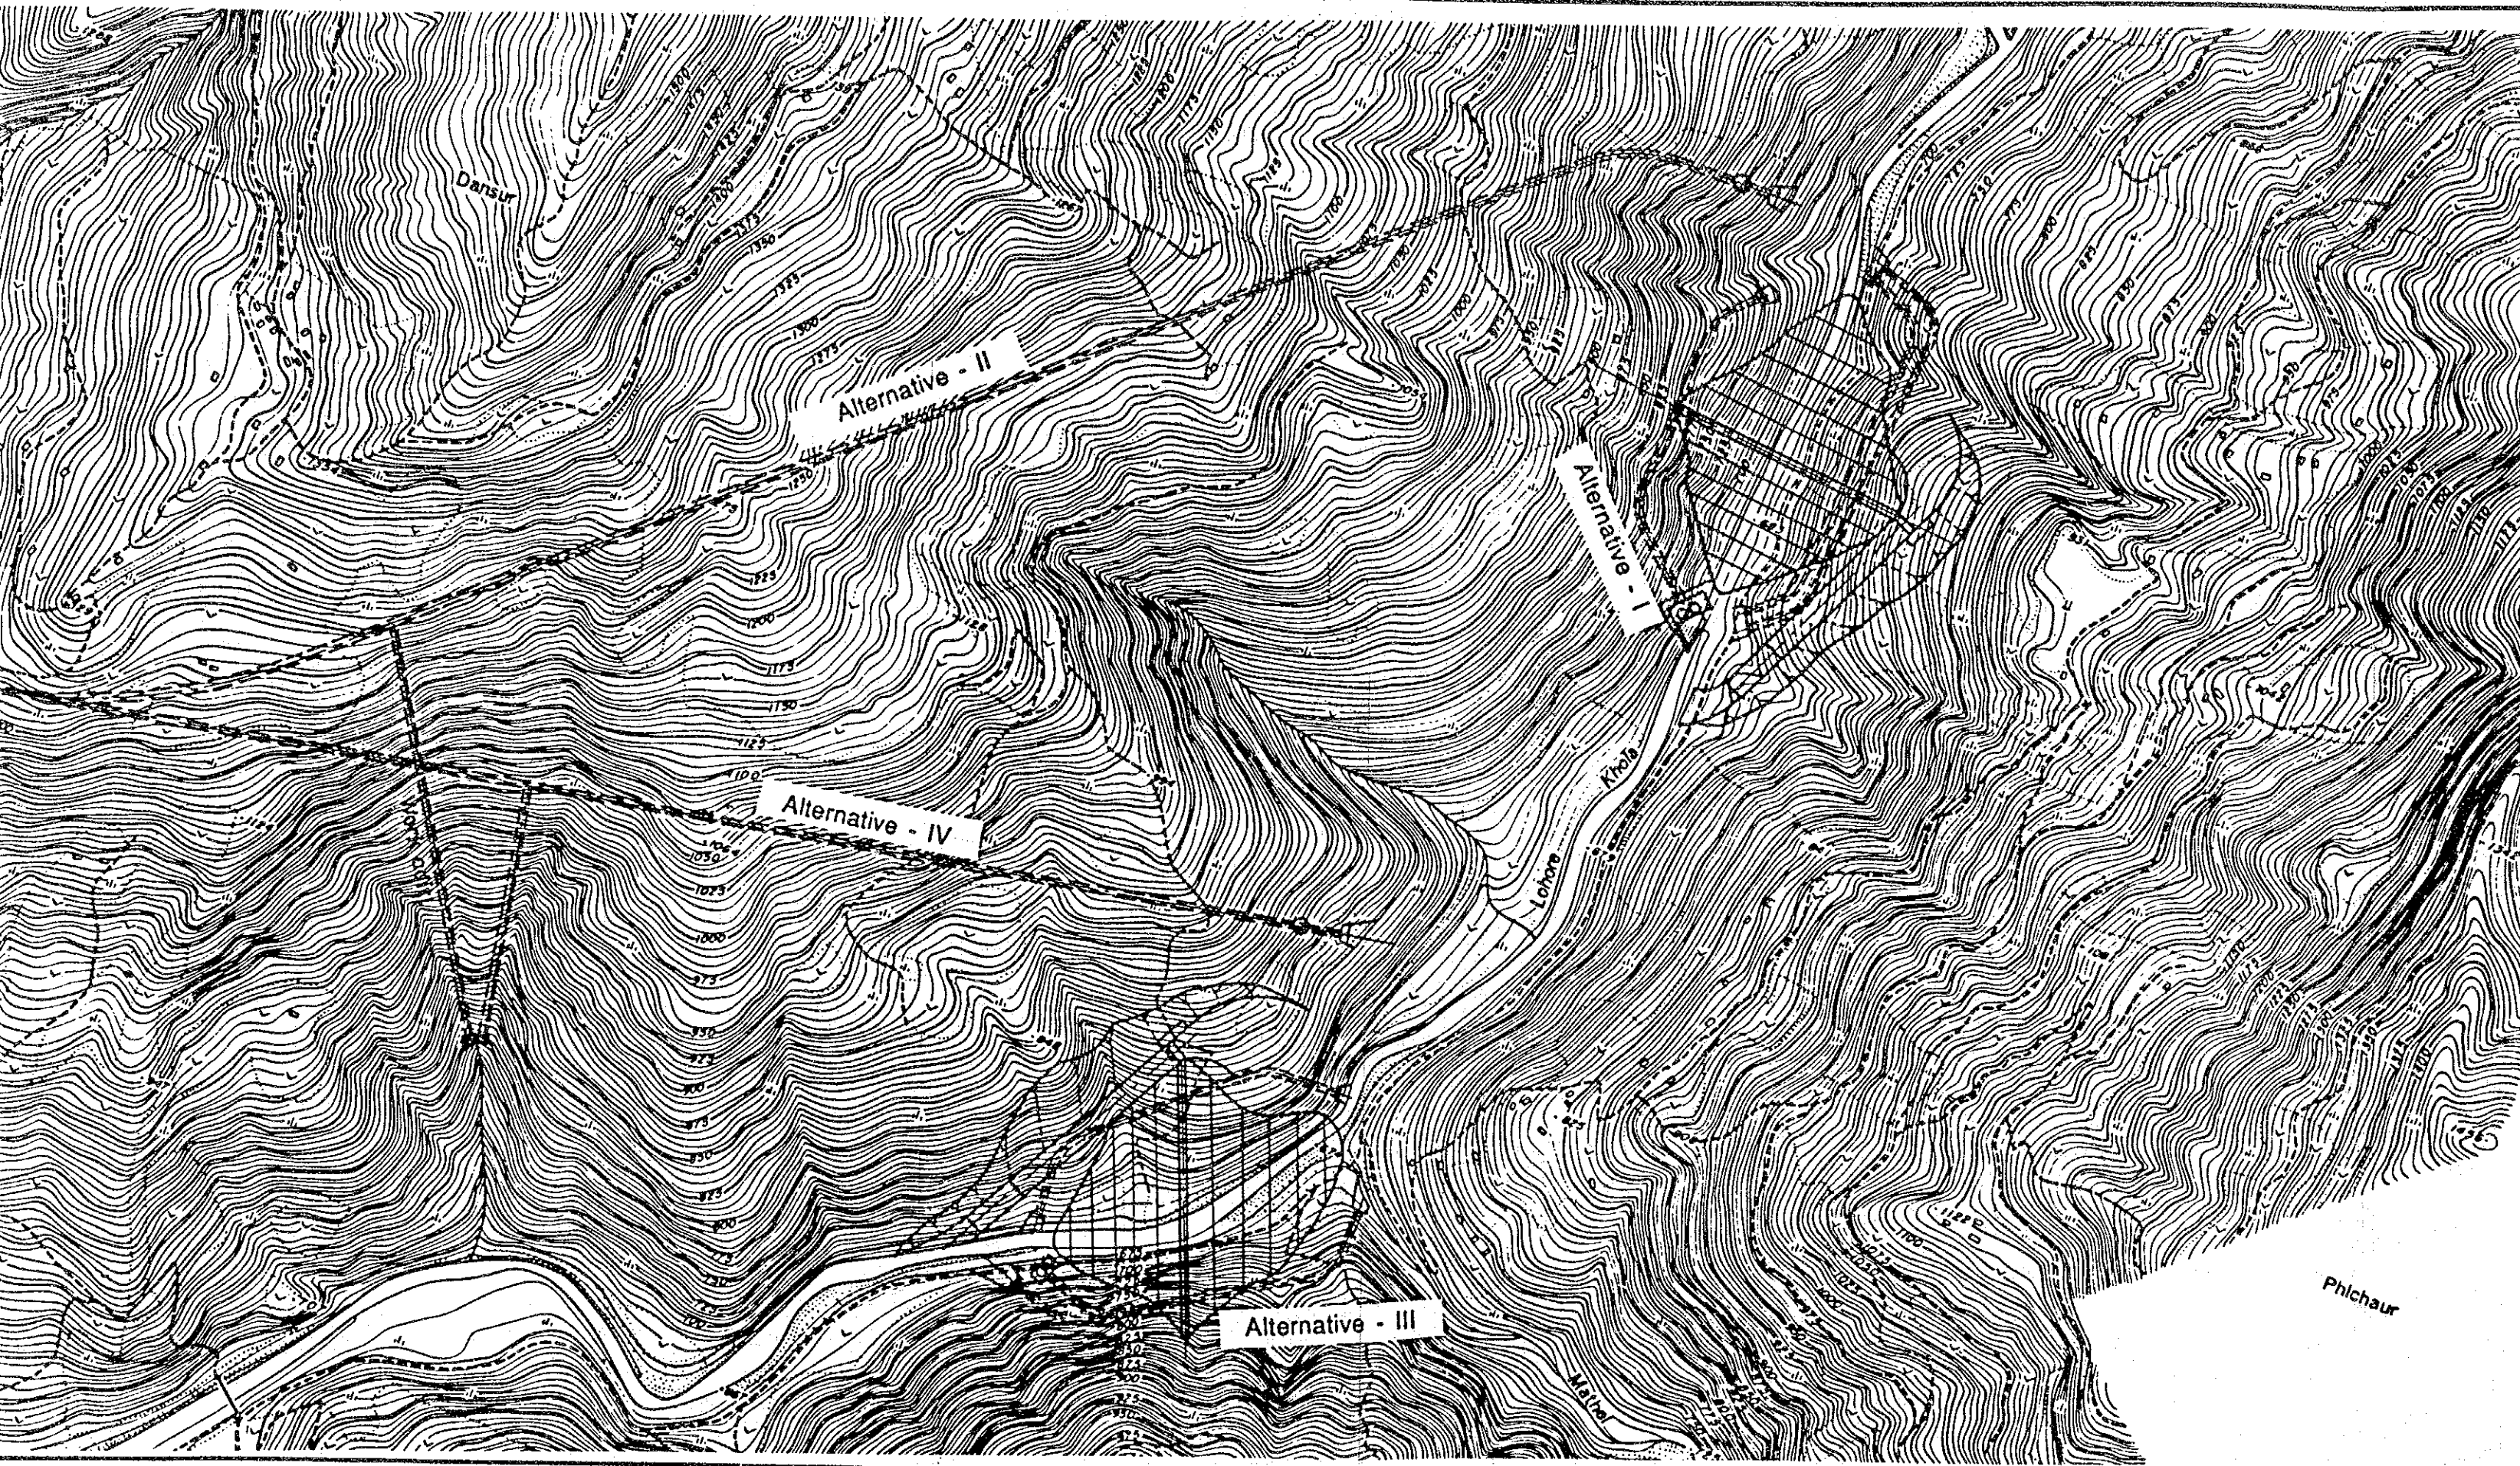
Layout Alternatives of LR-1 Scheme
